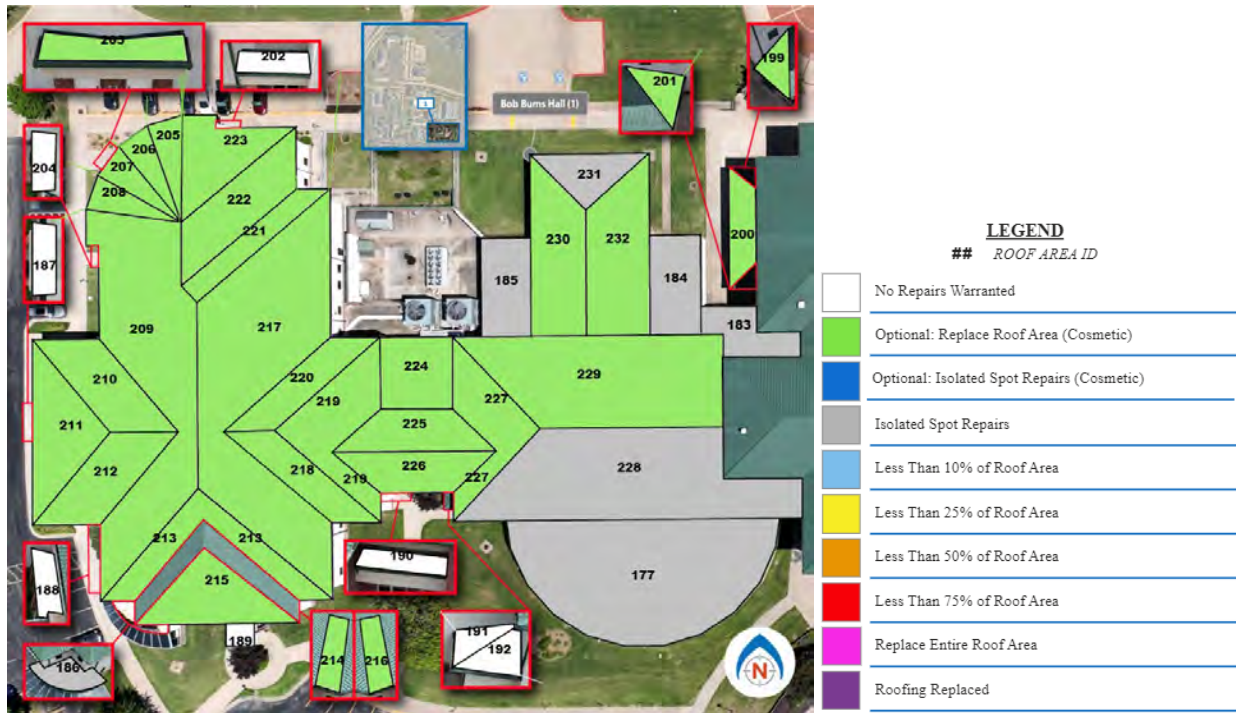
Excerpt of SAM Q-PDF® that depicts the minimum roofing repairs by color.
